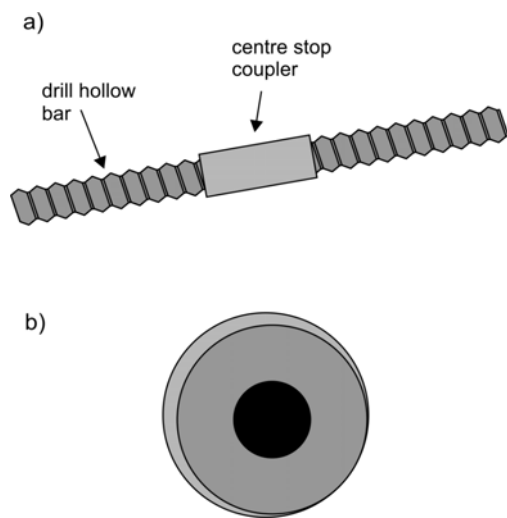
Scheme of self-drilling systems of ground anchors: a) two drill hollow bars connected by the centre stop coupler; b) cross-section of the bar
